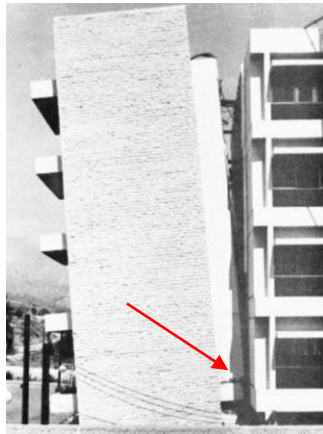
Permanent tilting of a stairway tower; San Fernando earthquake, 1971, adapted from (Jankowski, 2009)
